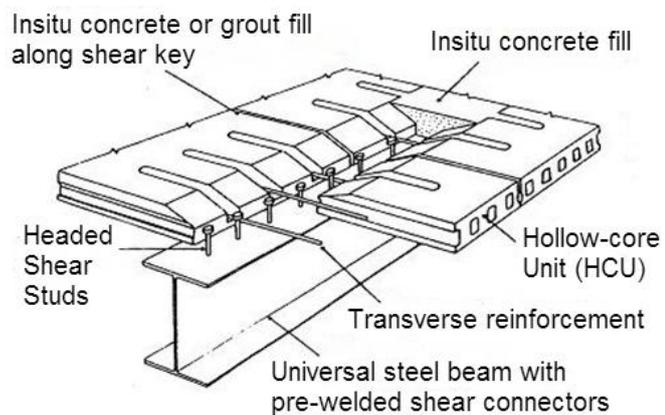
Structural mechanism between HCU and steel beams, adapted from [2.1].
